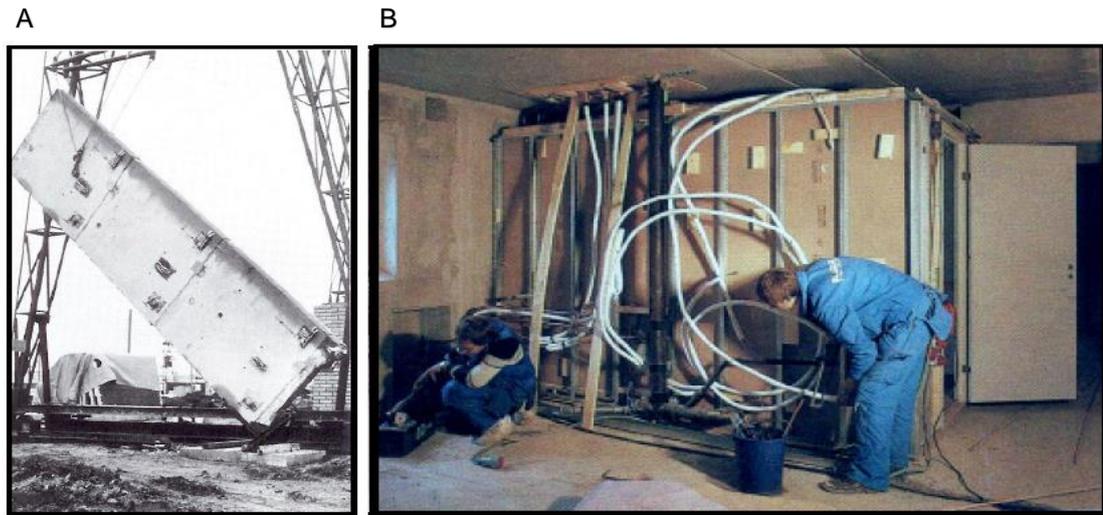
History of preassembled building services. A) Using a crane to upstand a three-floor building service wall. B) Connection of a shaft assembly to a stairwell (Source: Lennartsson, 2009).
